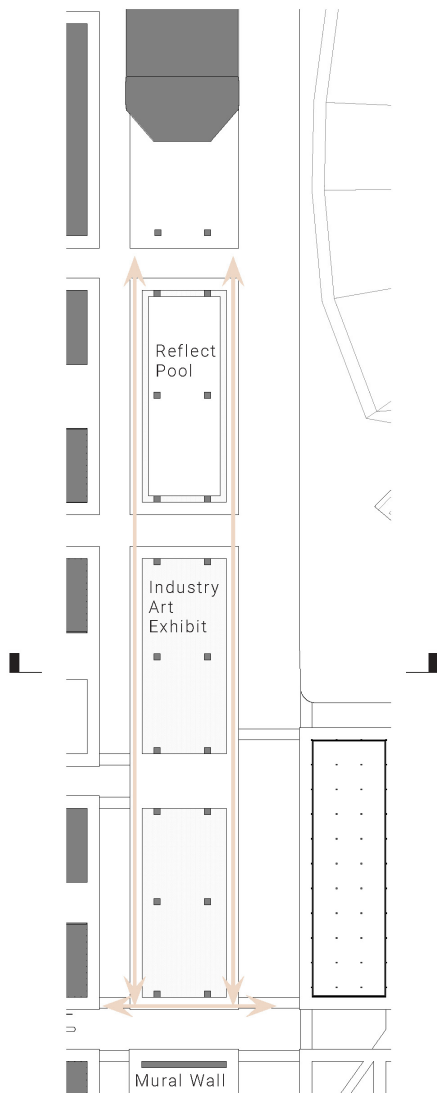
, Underpass - Enlarged Plan – Russel Street (Source: Drawn by Author)
